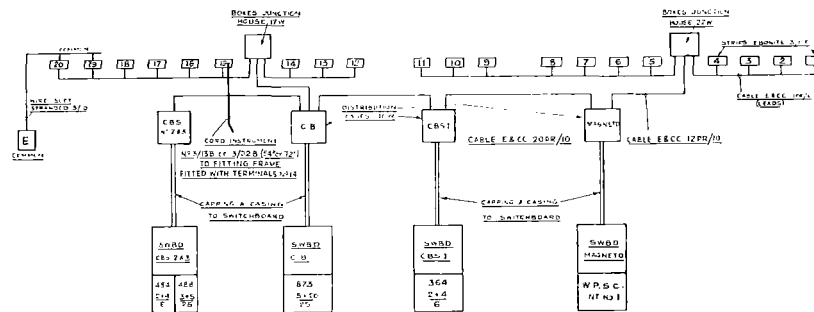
WIRING DIAGRAM OF FITTING ROOM.
